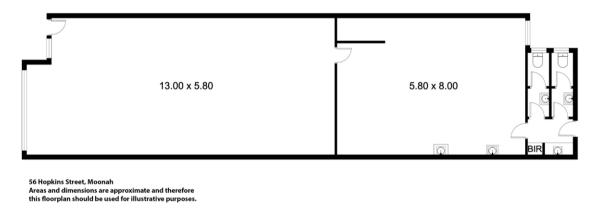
Existing floorplan (Realcommercial.com.au 2025)
